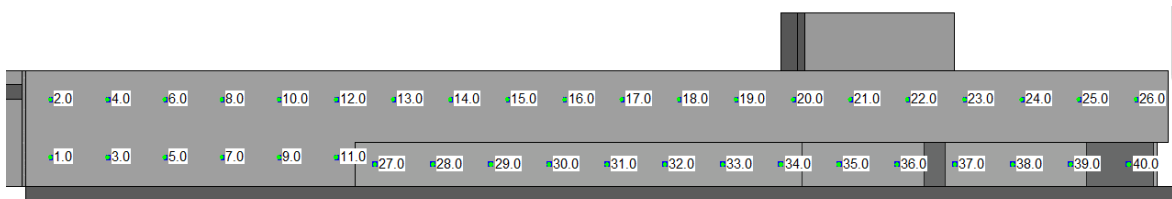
Central wall of Trindade Station, in Porto, Portugal
